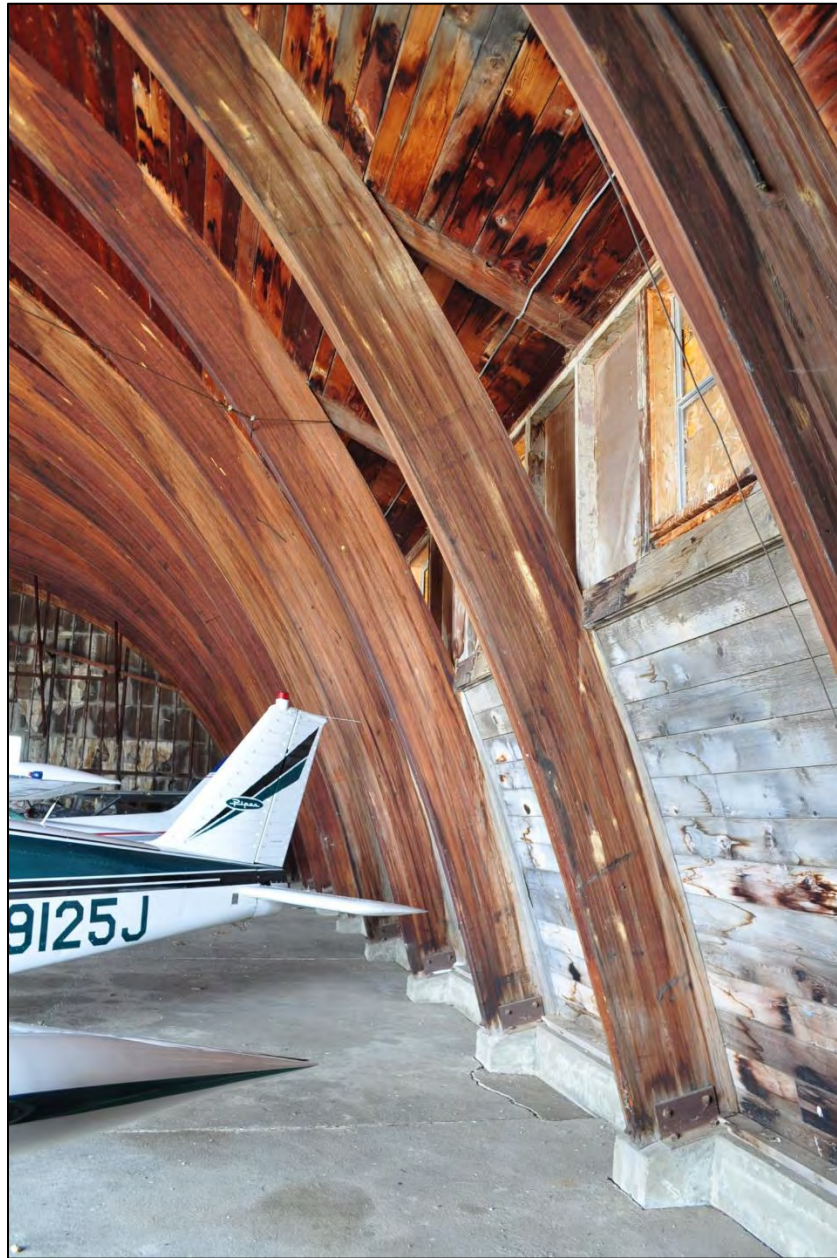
Structural supports for barrel hangar consist of compressed wood arches mounted on concrete piers. B. Moloney 3/15/2017.
